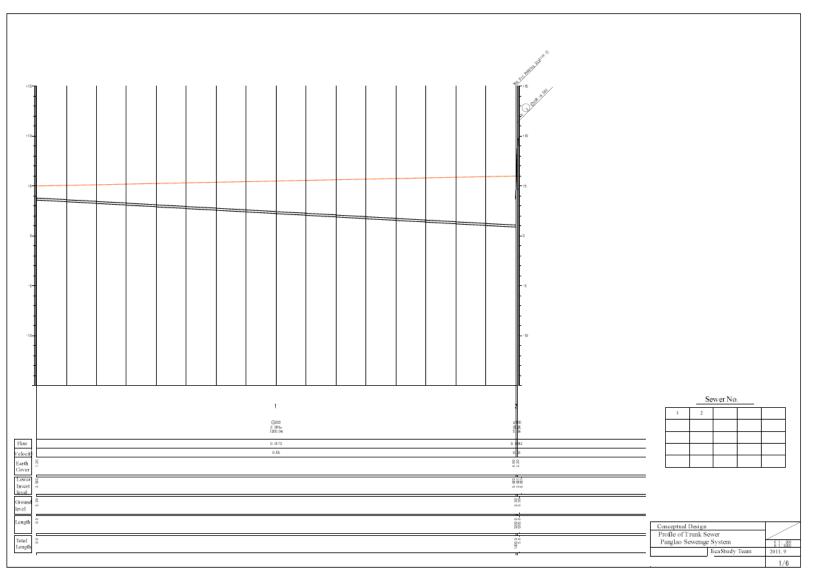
Profile of Trunk Sewer (Panglao Sewerage System)
